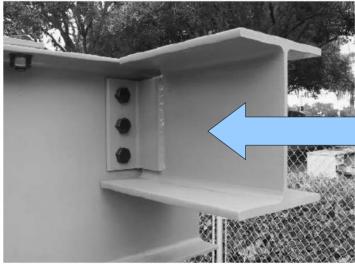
Shear Connection: Bolted-welded double-angle Girder B3 / Beam B3A
